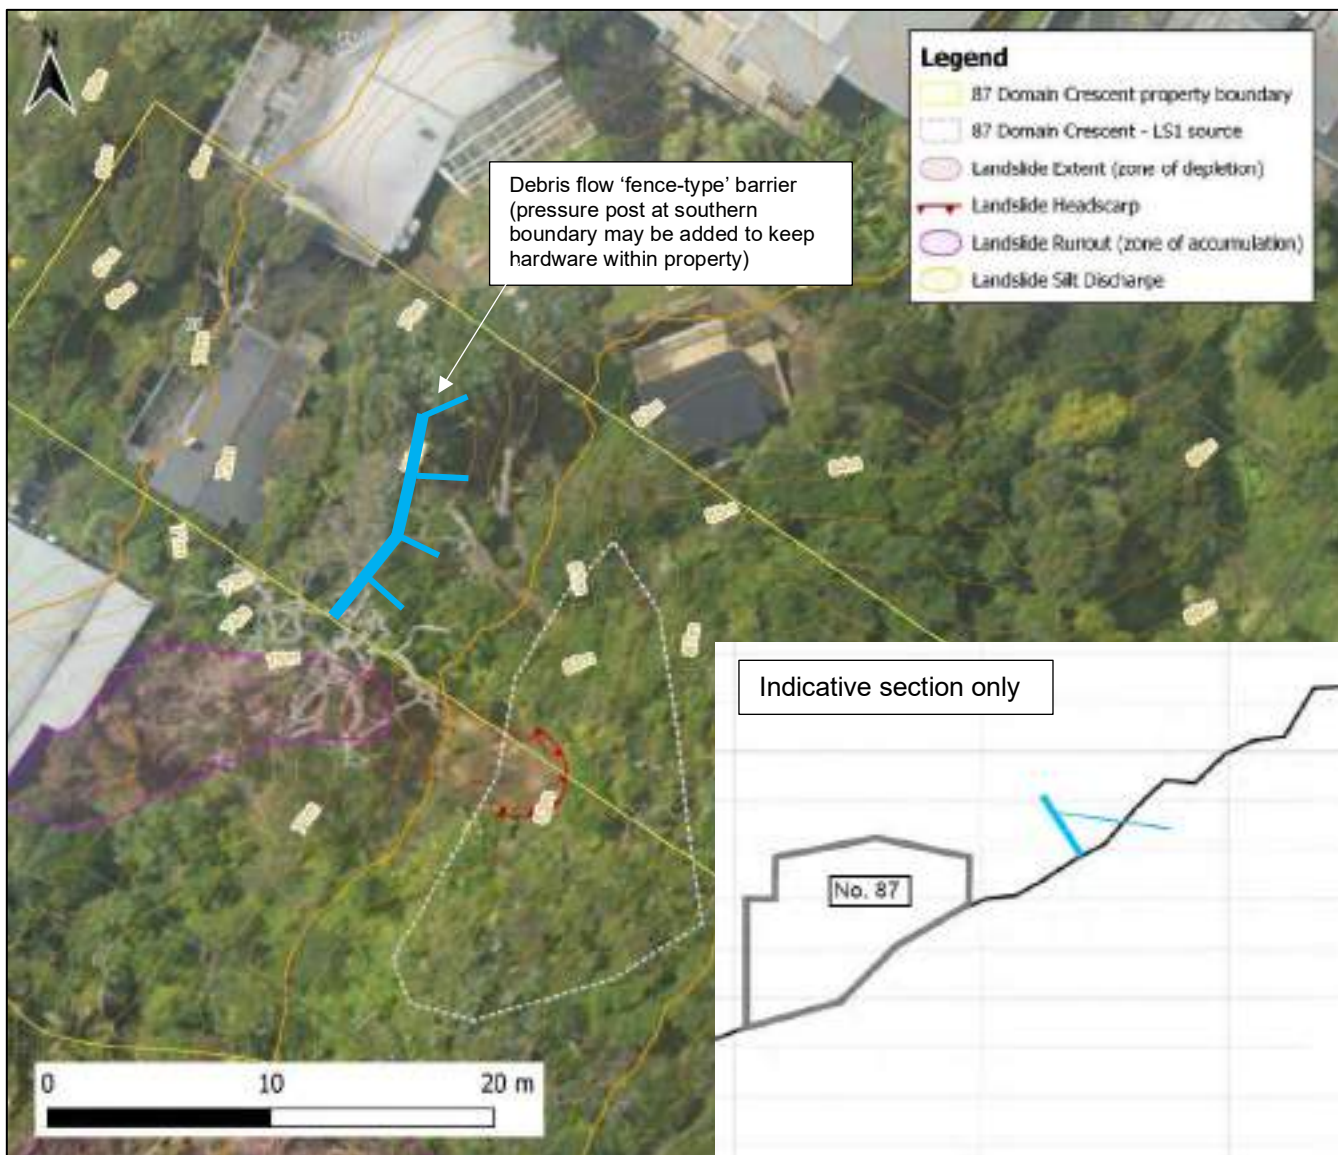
Site plan showing proposed mitigation option for 87 Domain Crescent
